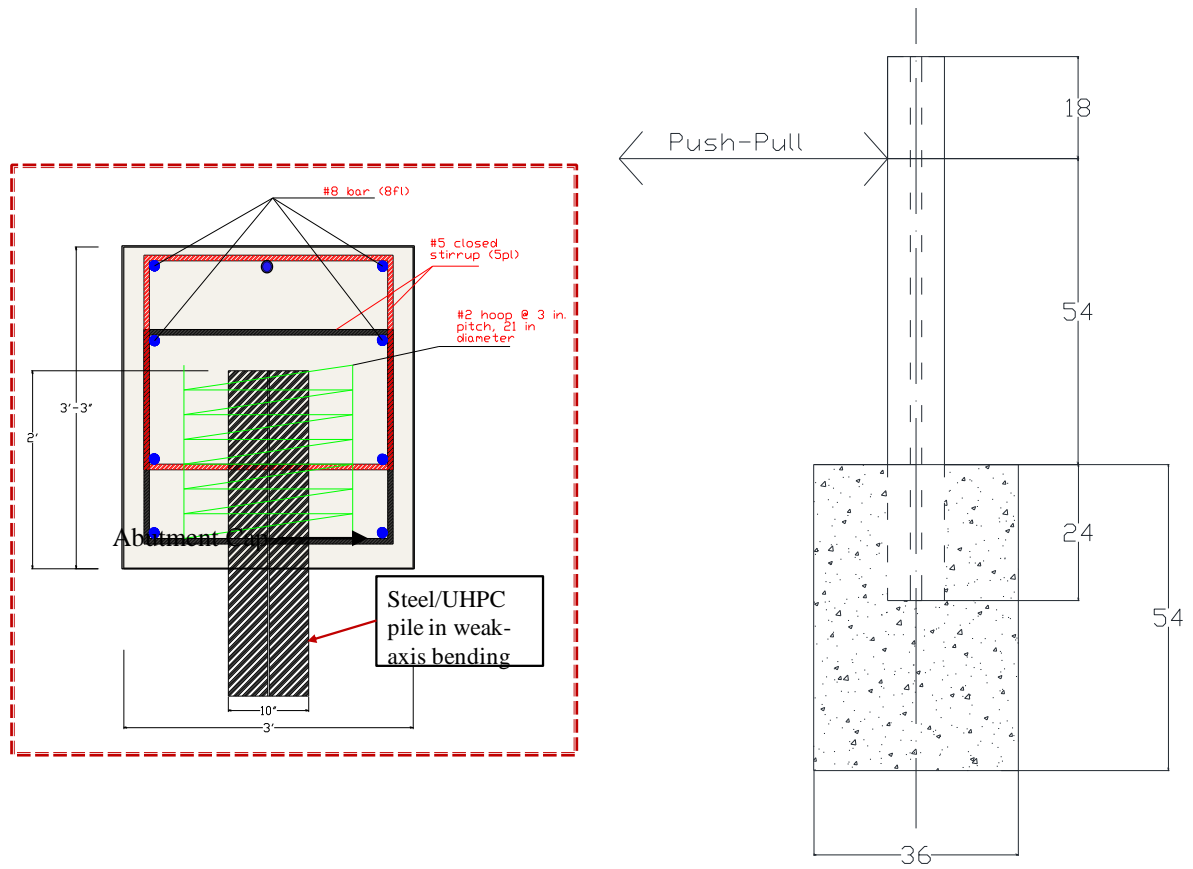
Outer Dimensions of the Abutment Block for SPAC-1 AND UPAC-2 (all dimensions in inches)
